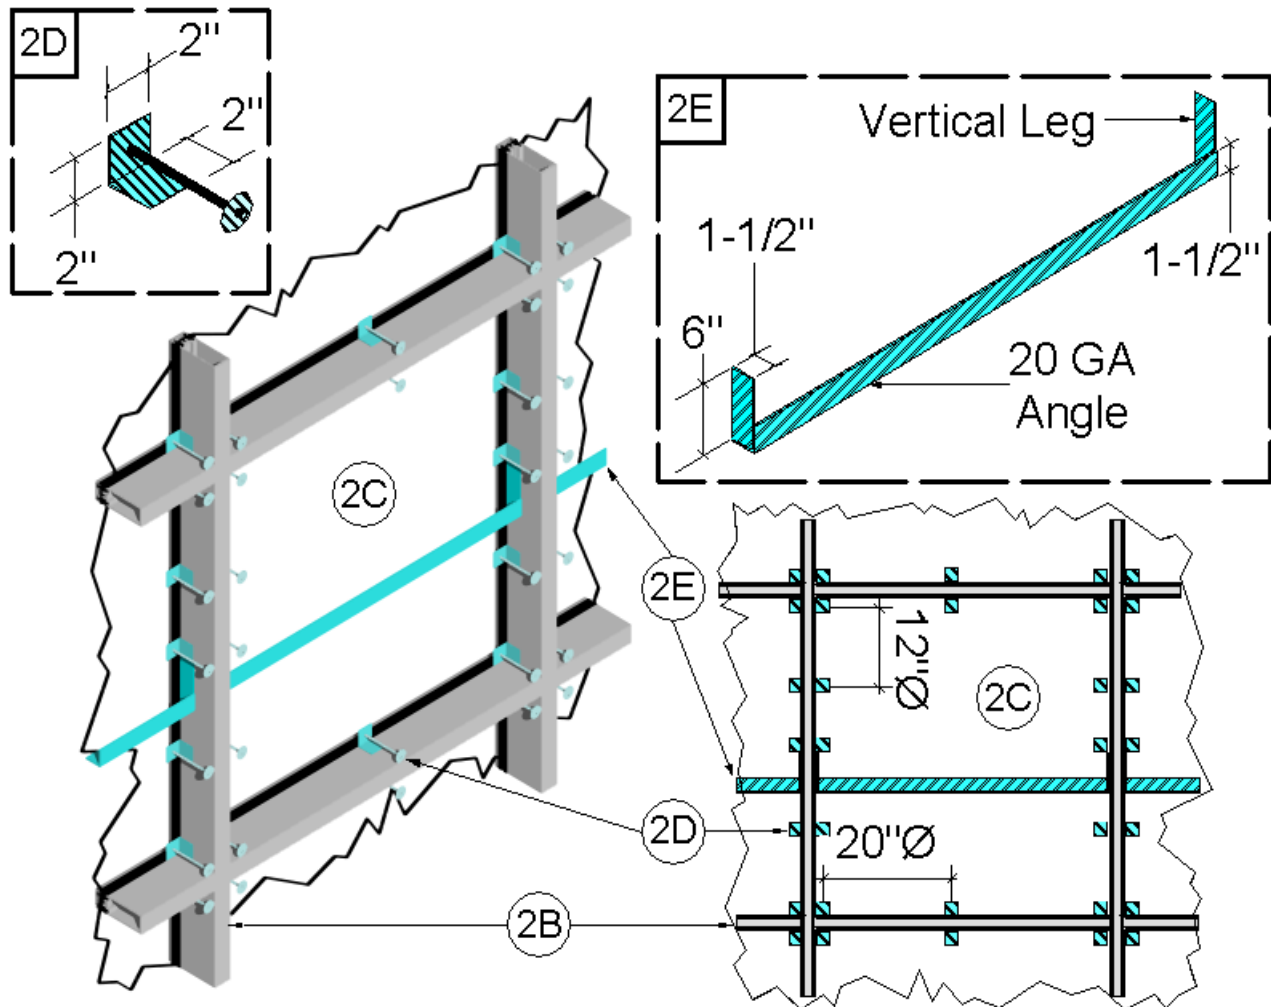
Aluminum Framing Isometric, Aluminum Framing Elevation, Impaling Pin Isometric, and Reinforcement Angle Isometric
